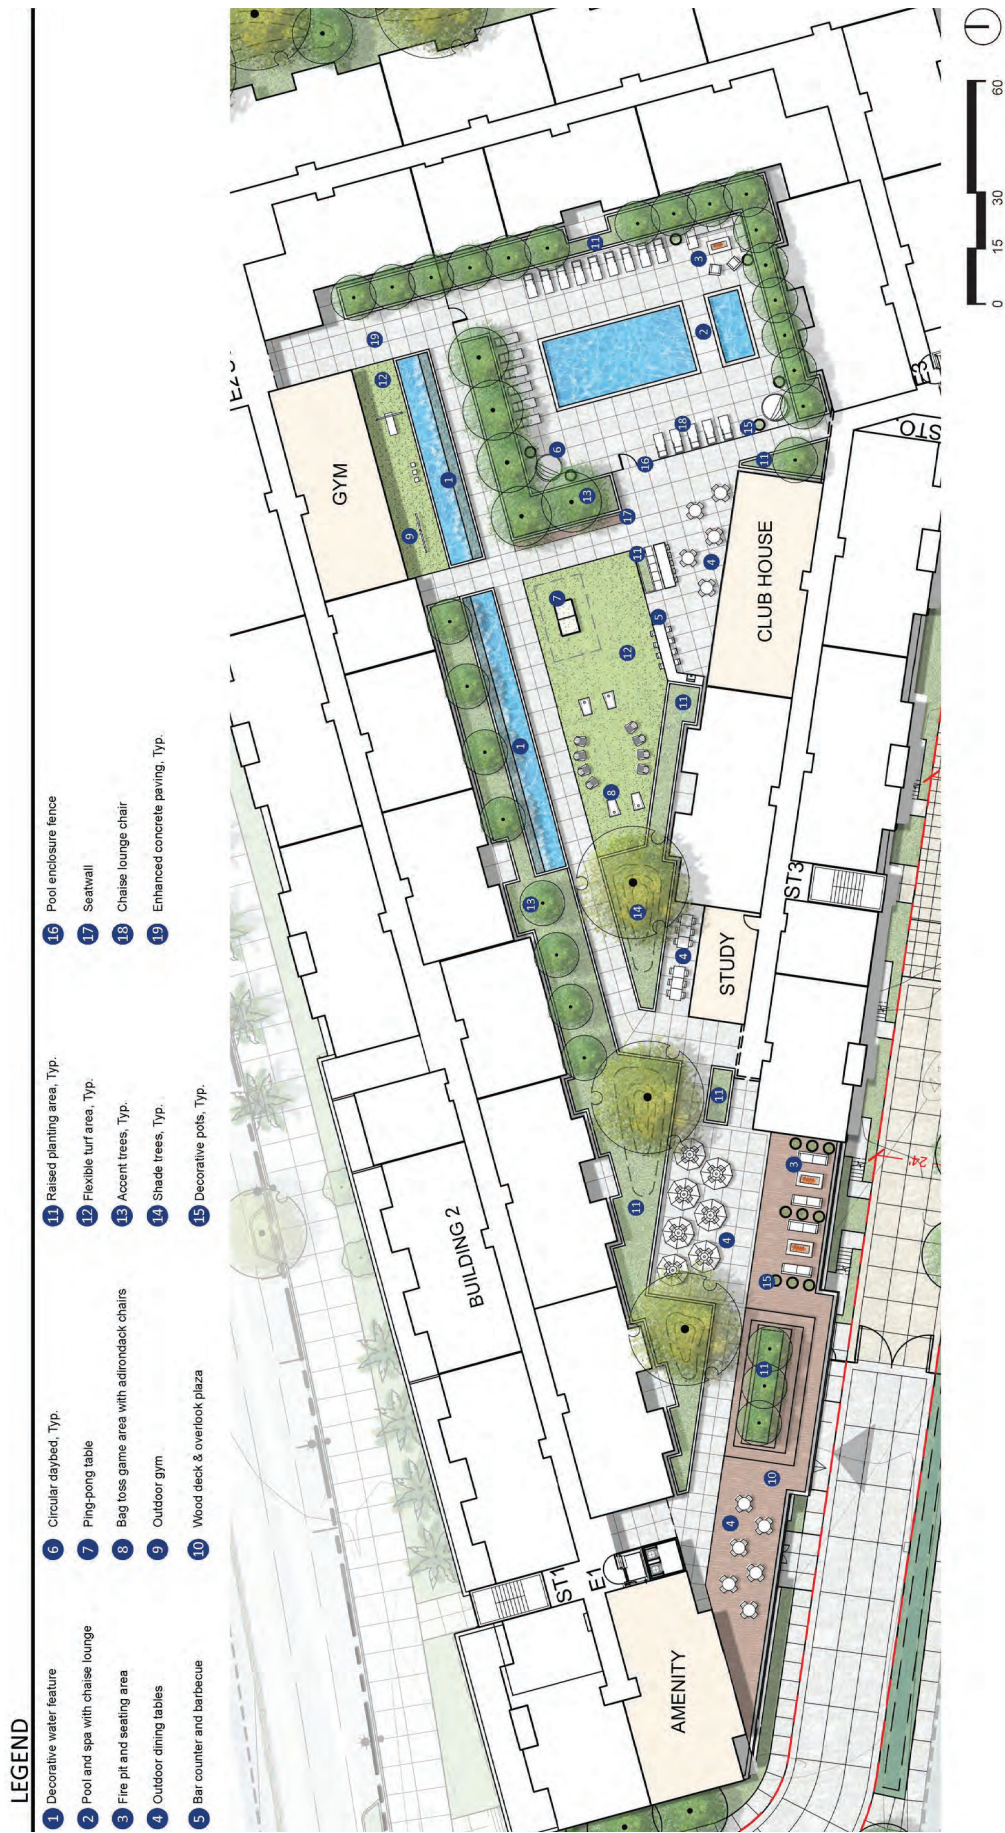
Plan View to Illustrate Podium Deck Open Space and Landscaping Concept
